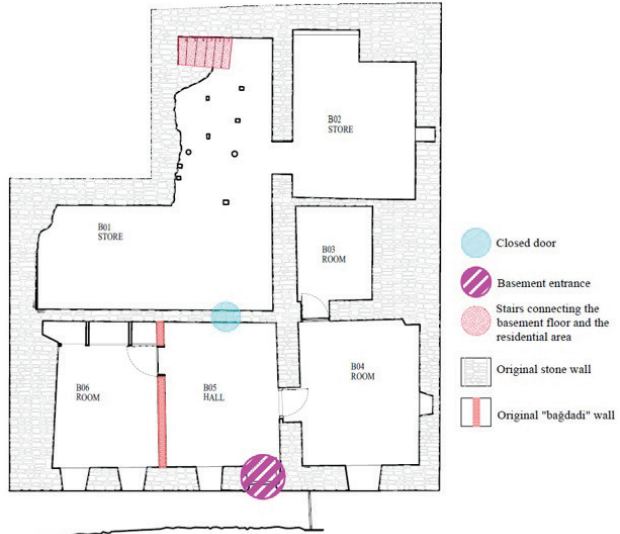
Basement floor plan. (Drawn by using Nazlı Keçeci's drawings, 2020)
